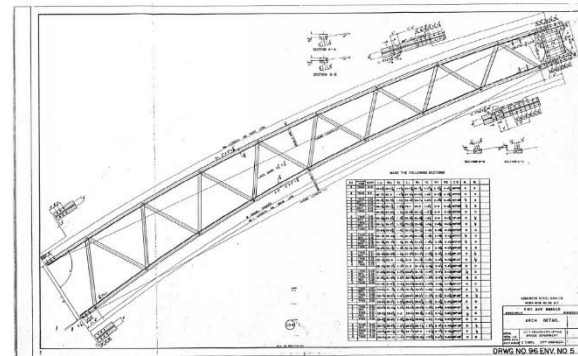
Typical elevation of Melan truss reinforcement in arch rib (from 1918 plans)
